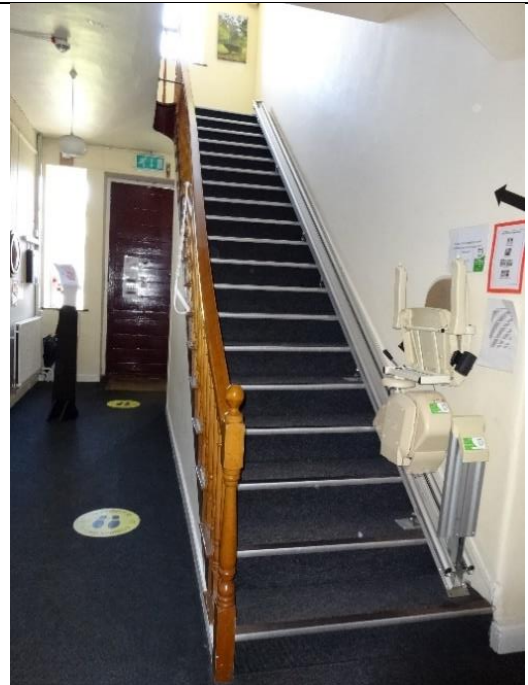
Principal staircase with modern replacement balusters, newels and handrail.
